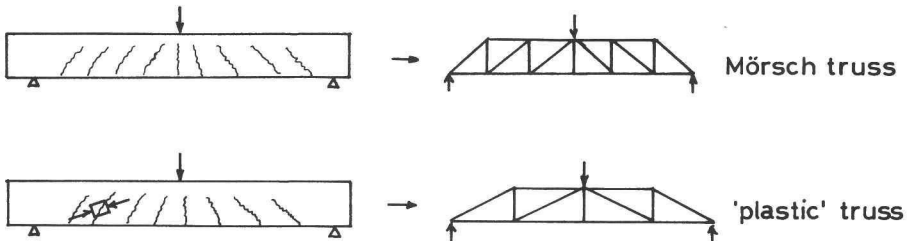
Mör sch truss analogy and plastic truss analogy
